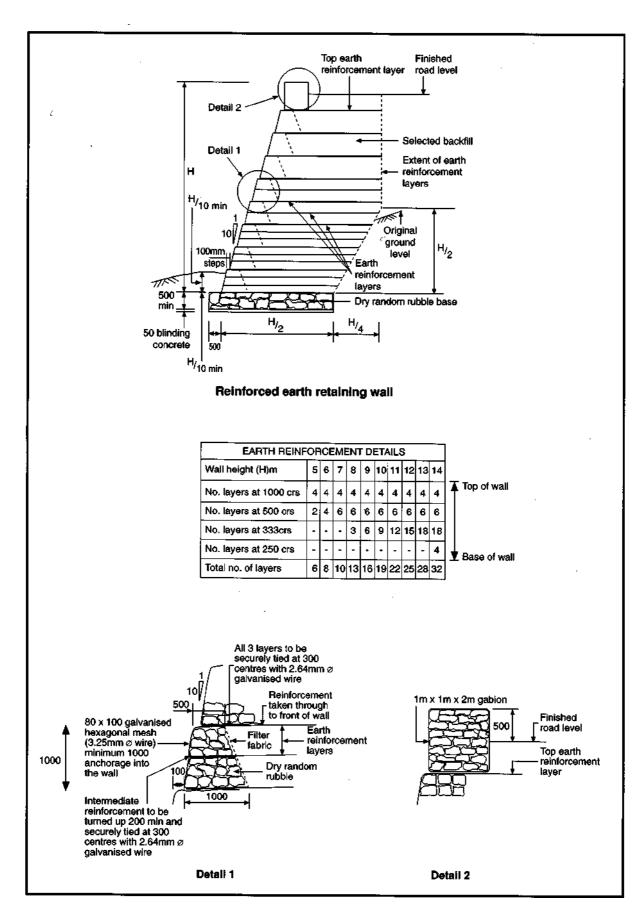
Typical details for gabion and reinforced earth retaining walls (continued)
